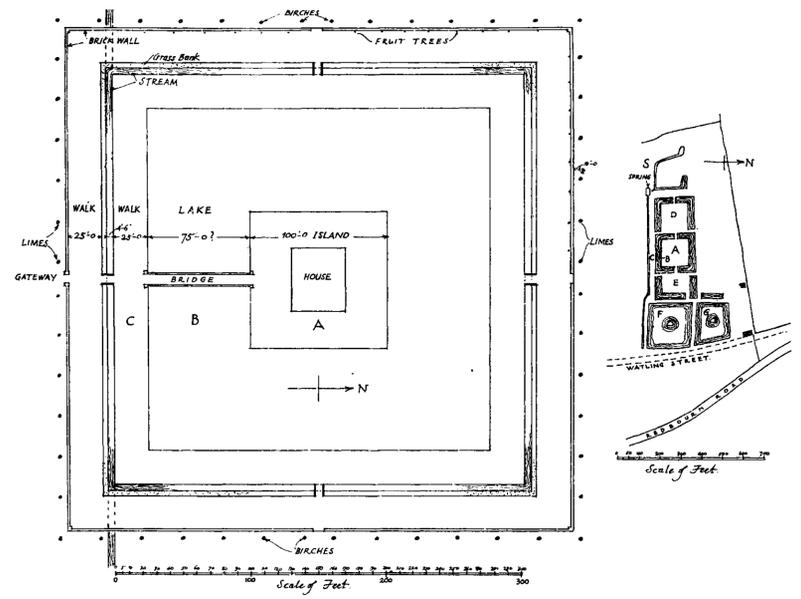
PLAN OF WATER GARDEN AND HOUSE ON AN ISLAND IN A LAKE MADE FROM BACON'S NOTES OF 1608. ON THE RIGHT A PLAN OF THE PONDS AS EXISTING.
